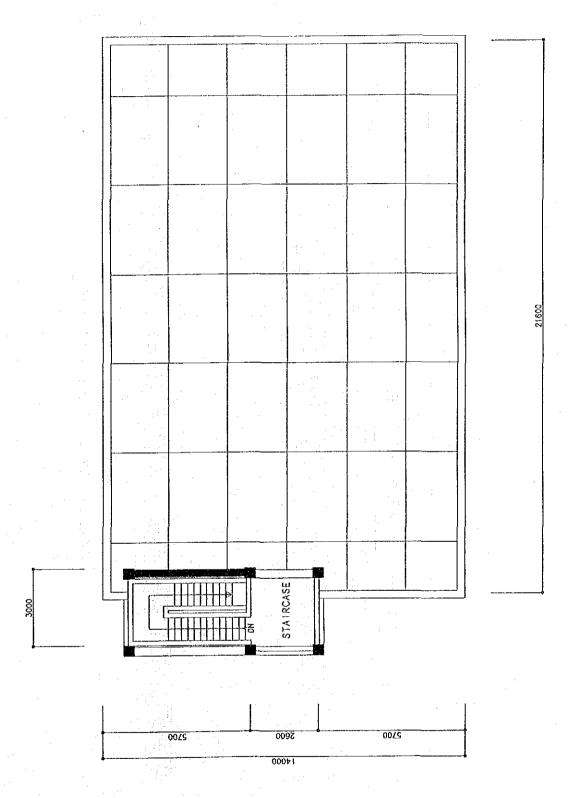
(3) ROOF FLOOR PLAN (3-CLASSROOM TYPE)
